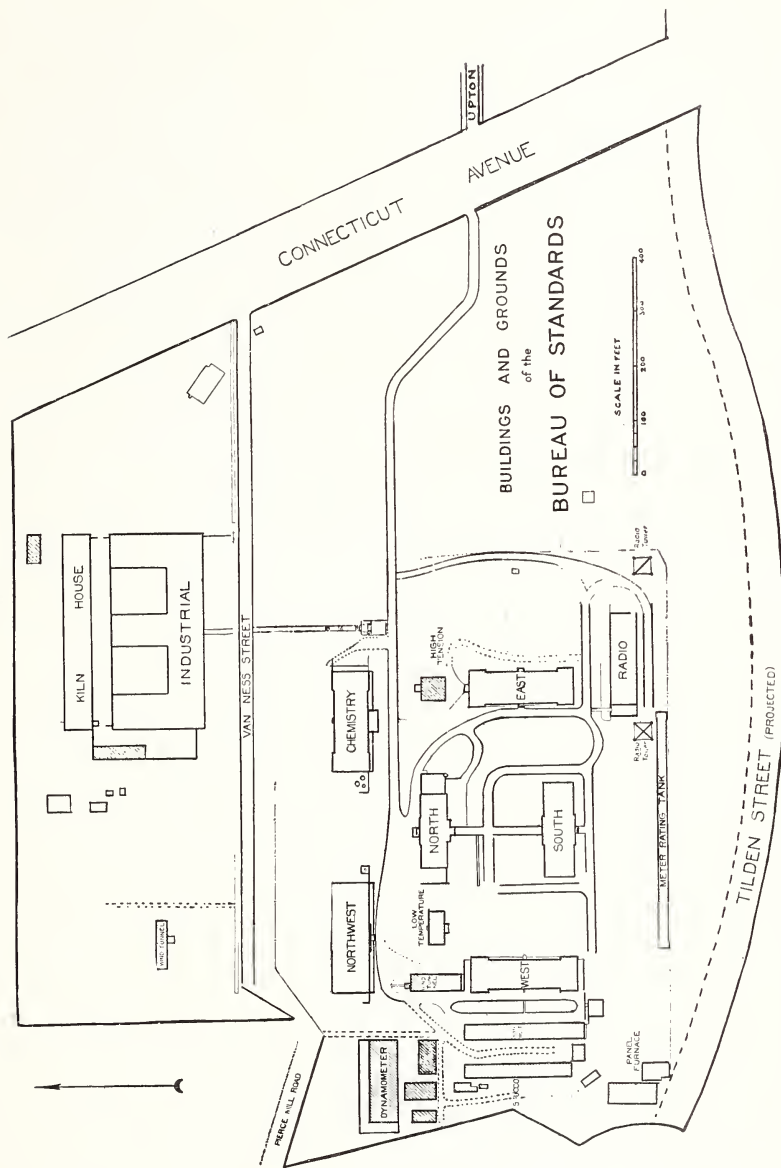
Plan of site showing location of buildings of the Bureau of Standards. (See key view on p. 112)
